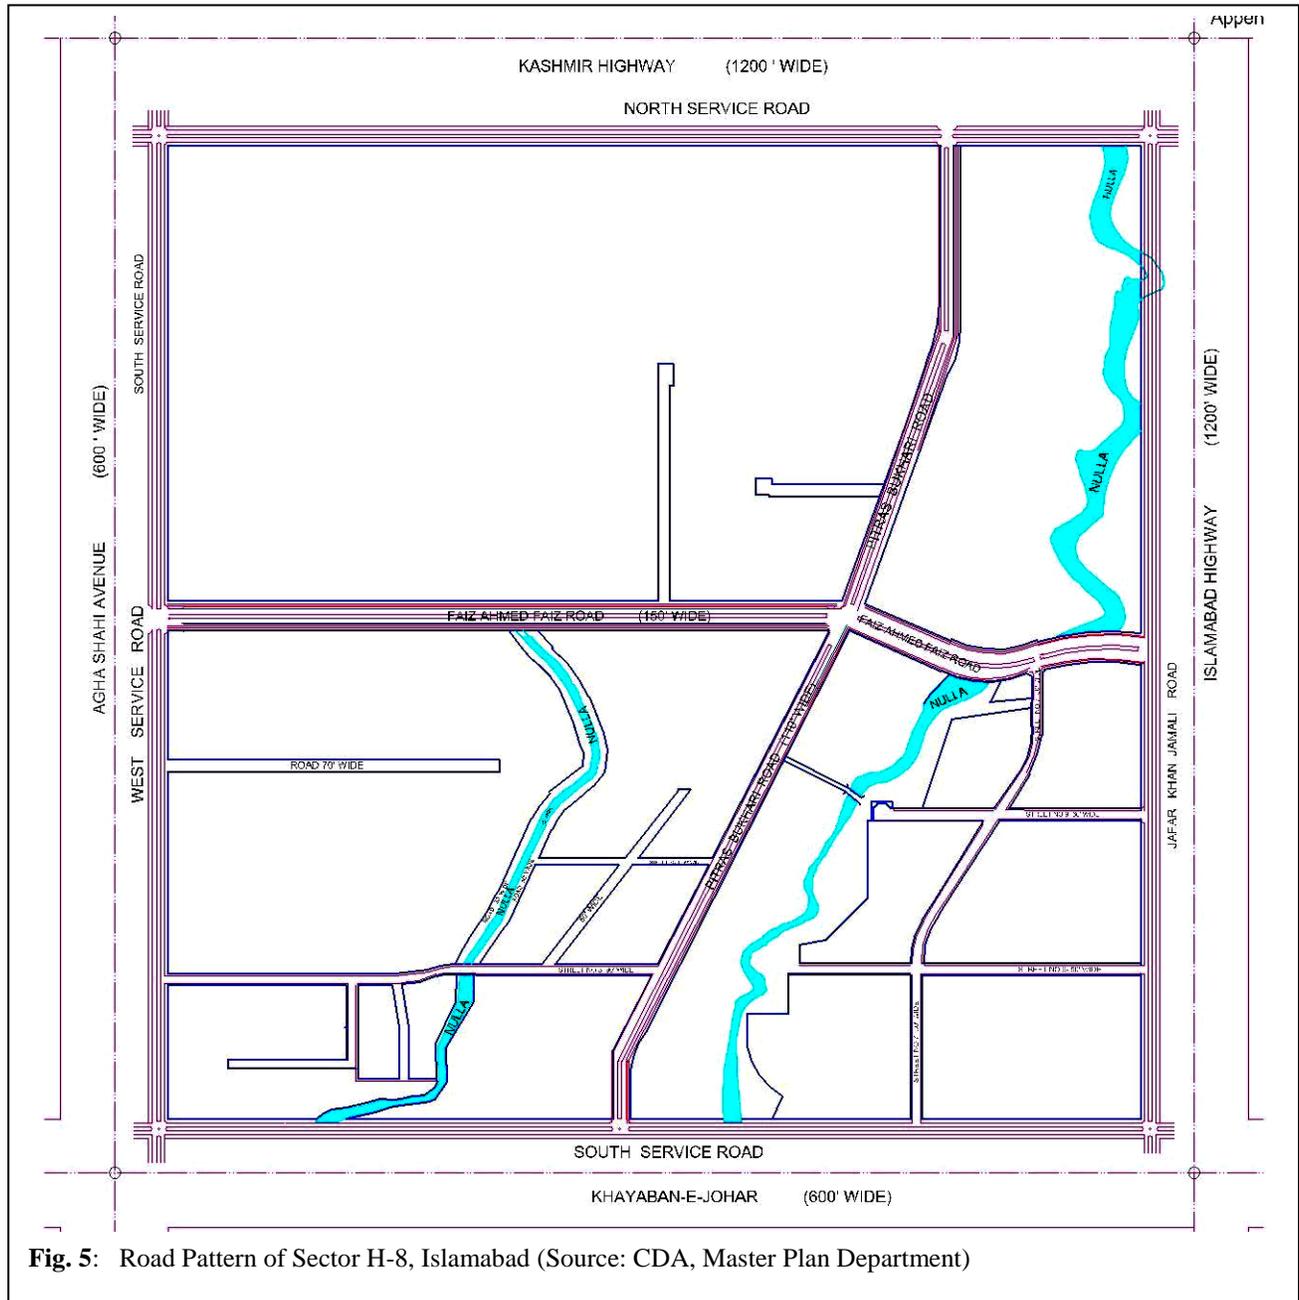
Road Pattern of Sector H-8, Islamabad (Source: CDA, Master Plan Department)
